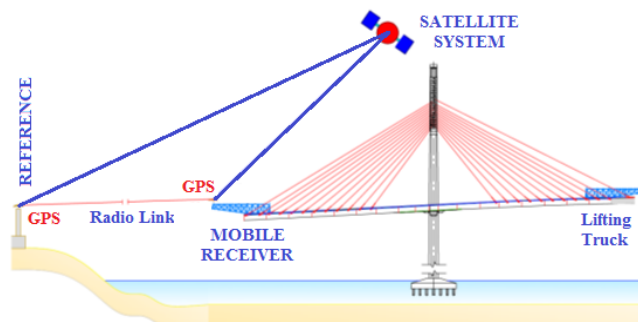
GPS scheme applied during the construction of Bridge of Cádiz
